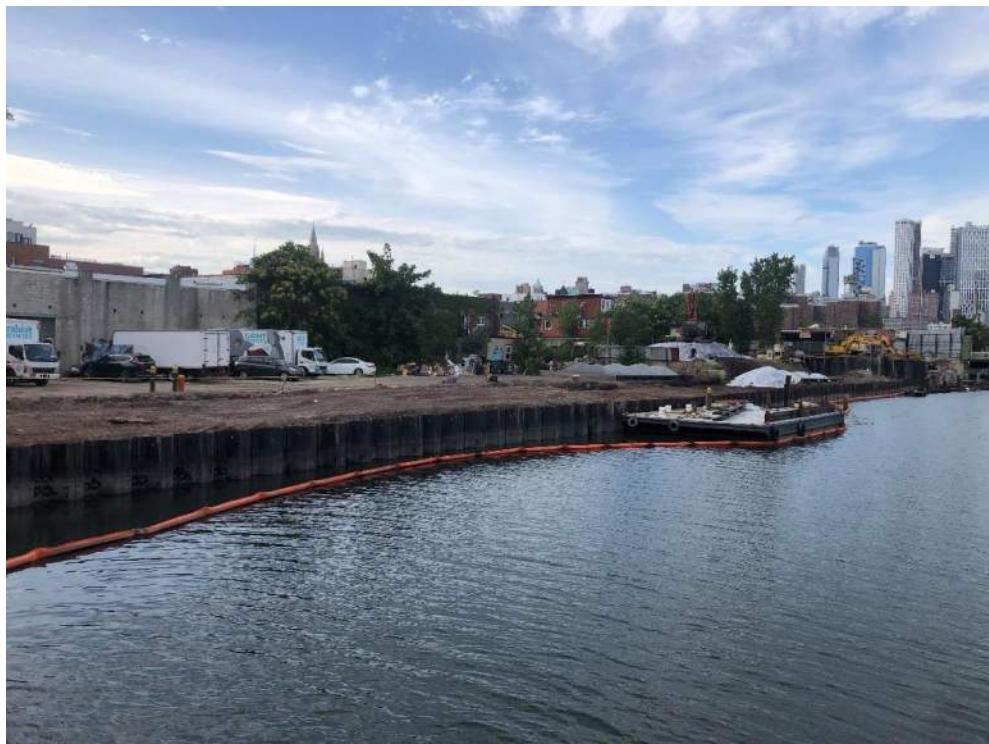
View of the site at the end of the day from the Carroll Street Bridge (facing northwest).
